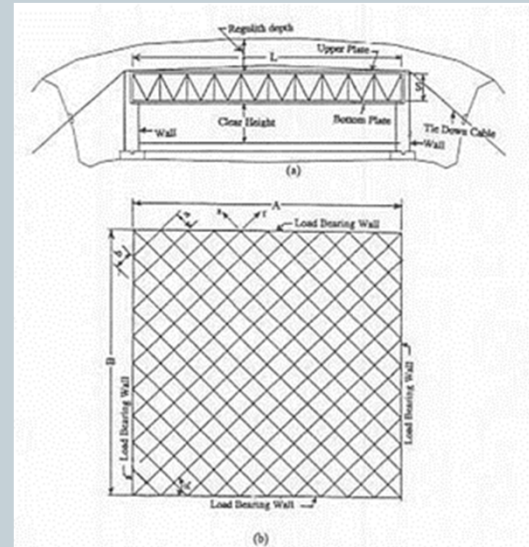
Proposed Braced Double-Skinned Roof Structure for Lunar Base: (a) Cross-Sectional View; (b) Plan View
